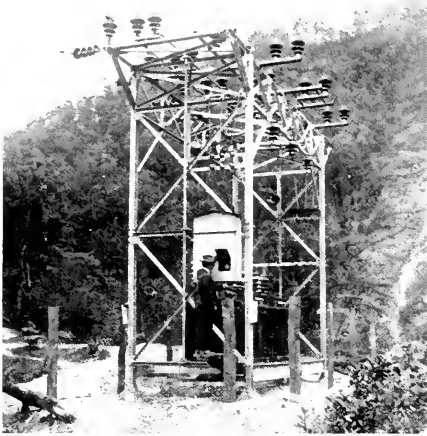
44 000 VOLT OUTDOOR SUBSTATION
